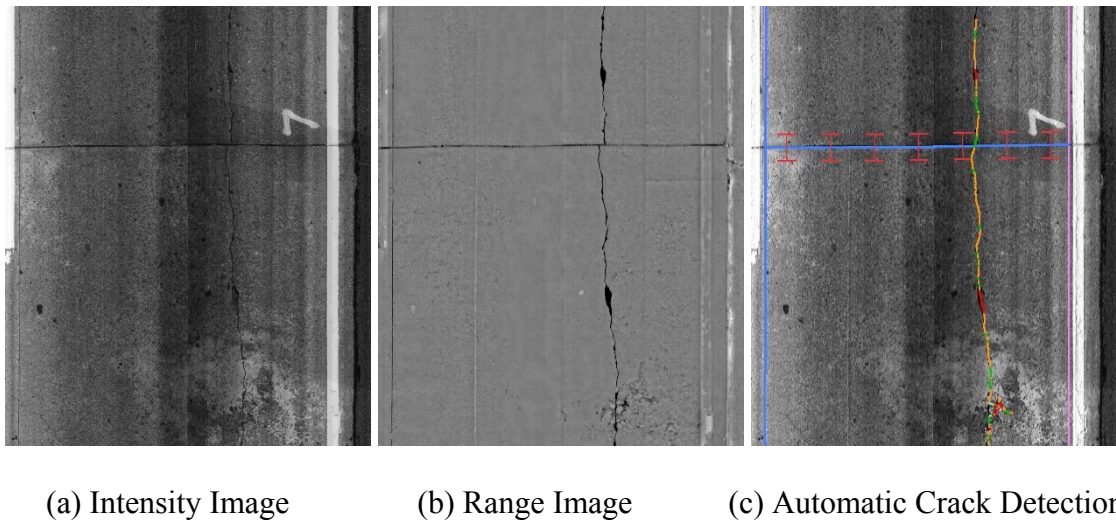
Crack detection on Slab #7 on I-516 test site (Score: 93.4601)
